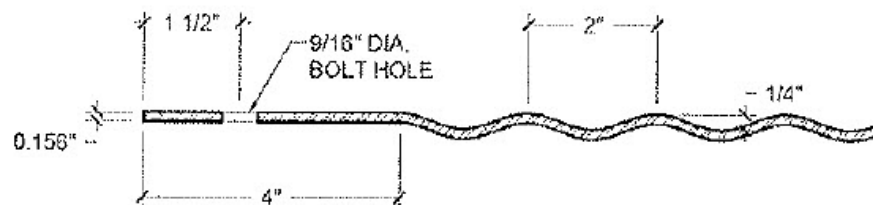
Corrugated Steel Soil-Reinforcing System (Sine Wall 2018)
